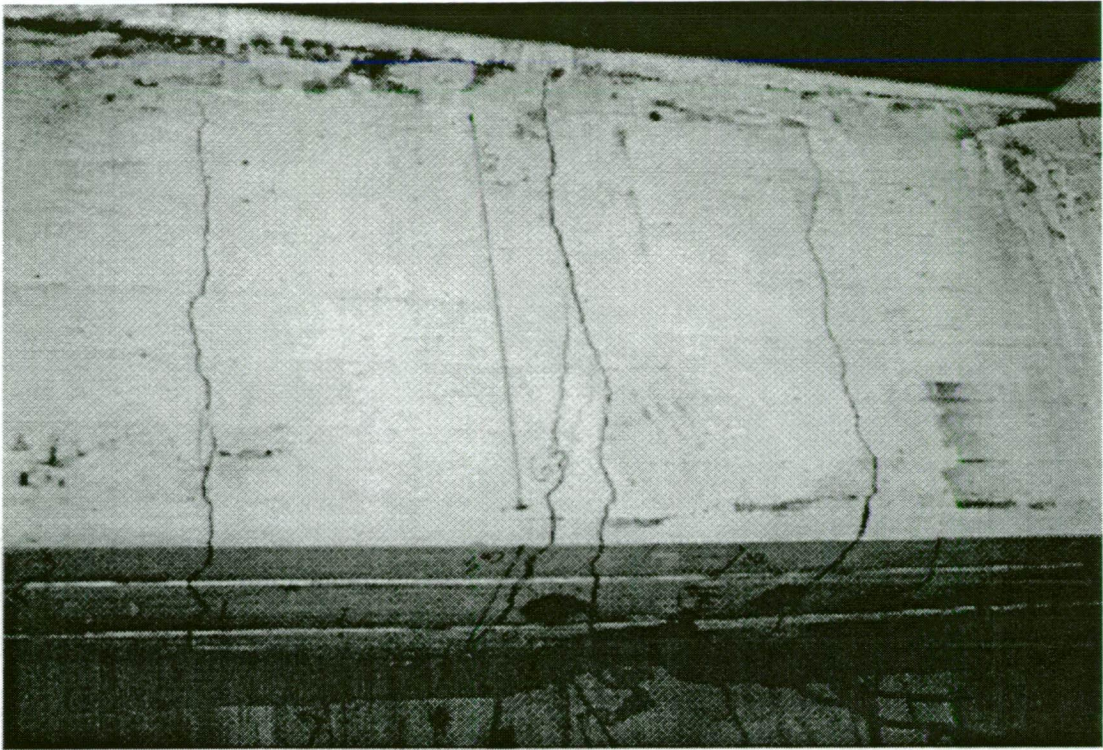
Cracking of Third Beam at Ultimate Load
